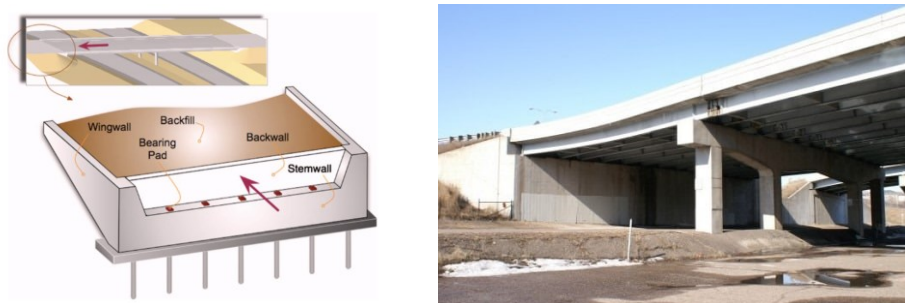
Schematic (left, from Shamsabadi *et al.* (2010)) and photo (from <https://theconstructor.org/structures/bridge-abutment-seismic-retrofitting/17696/>) of a typical seat-type abutment system.
